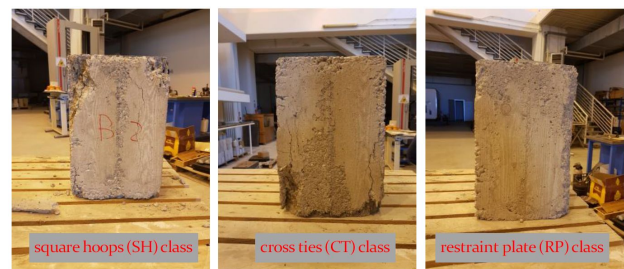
Typical crack patterns at failure of the medium-strength concrete columns with different arrangements of transverse reinforcement
